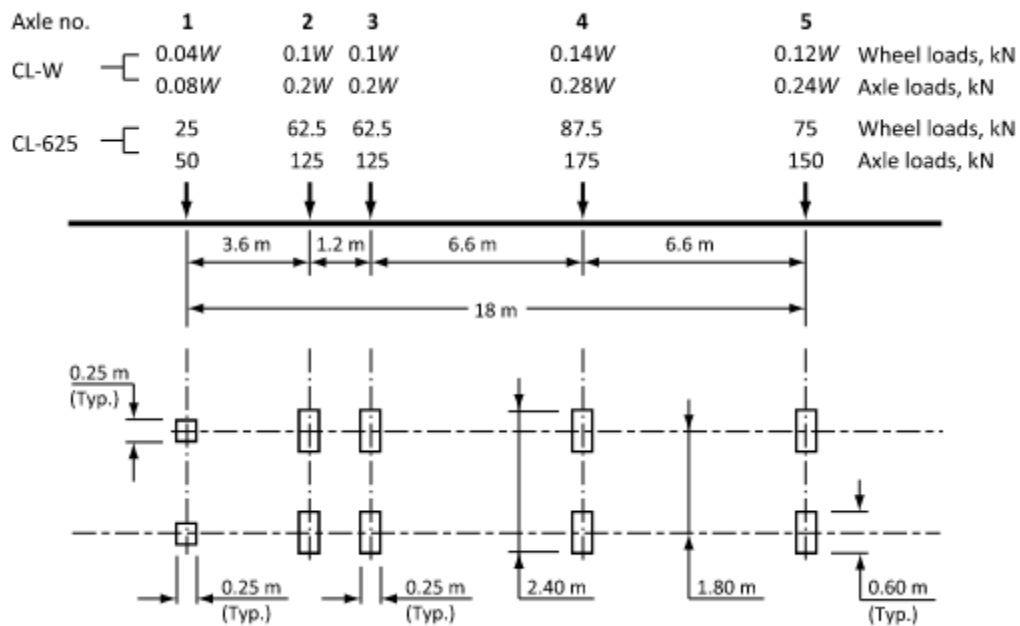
CL-625 Truck Wheel Layout (S6-19)
